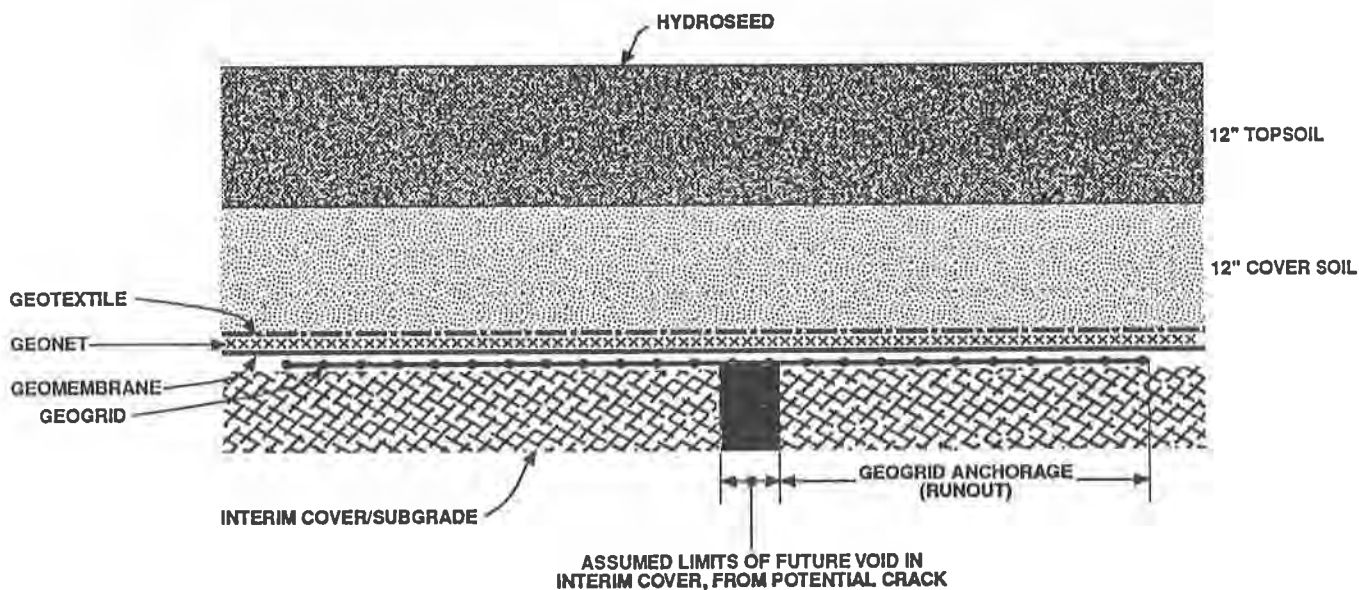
Geogrid Reinforced Foundation Over Potential Crack
